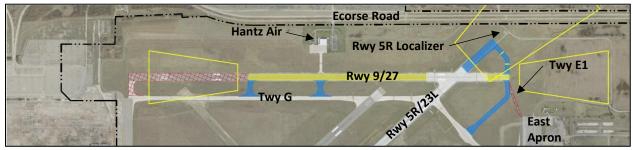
Alternative 4: Reconfigure Runway 9/27 to 5,000 feet by 100 feet & Extend Runway 5R/23L 780 feet
